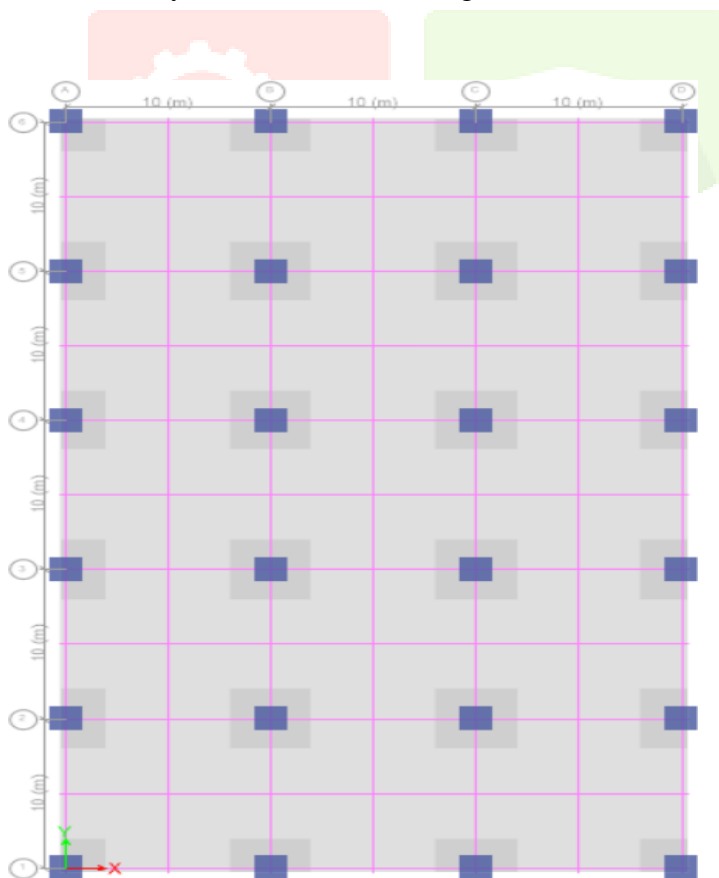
10m Spacing of Columns for RCC Flat slab structure
